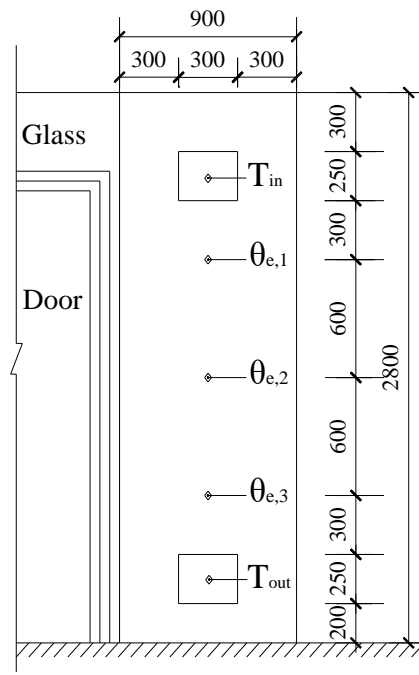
Schematic diagram of external surface of the concrete collector wall.
